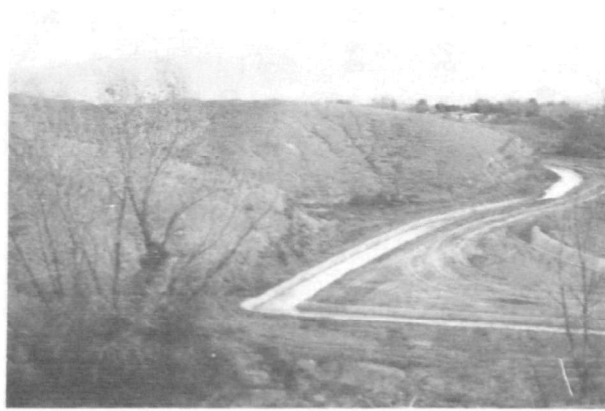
Slip form concrete lined section of the Stub Ditch.
